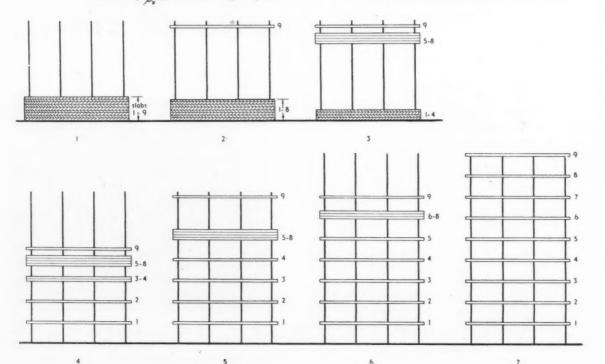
The sequence of lifting operations: (1) first column lift in position, all slabs poured. (2) Roof slab raised to top of columns, temporarily "parked." (3) Slabs 5-8 raised and temporarily "parked." (4) Slabs 1-4 raised, 1, 2 and 3 fixed in their final positions, second column lift in position. (5) Roof slab raised to top of columns, slabs 5-8 raised, 6, 7 and 8 temporarily "parked," 5 in final position, 4 raised and in final position. (6) Third column lift. (7) All slabs in final position.
